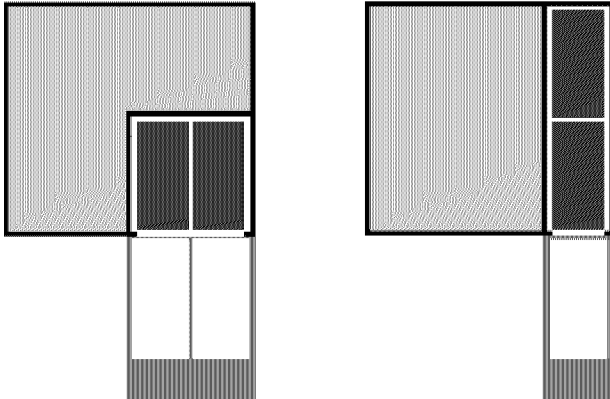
A – Parking Spaces in Garage (Blue) and Improved Parking Pad (Yellow)
